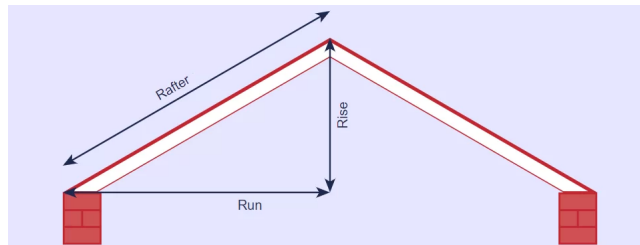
Overview of the roof lengths required to calculate the roof pitch factor. The roof tilt angle (β) is the angle between the rafter and the run [88].
